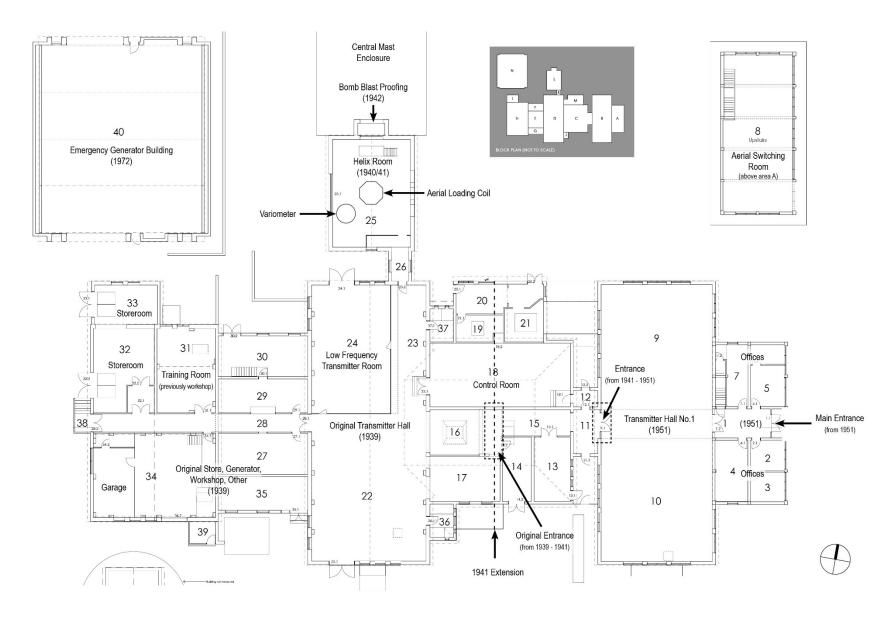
Transmitter Building with construction dates, room numbers and labels. (Source: Philip Leeson Architects base plan 2009, with GML overlay 2019)
